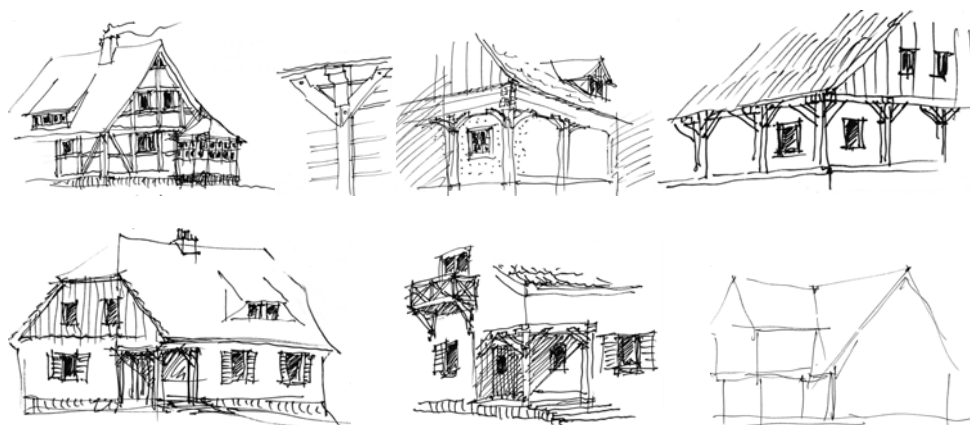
The author's modification of the construction external wall with the partial formal adaptation of the wall frame construction
